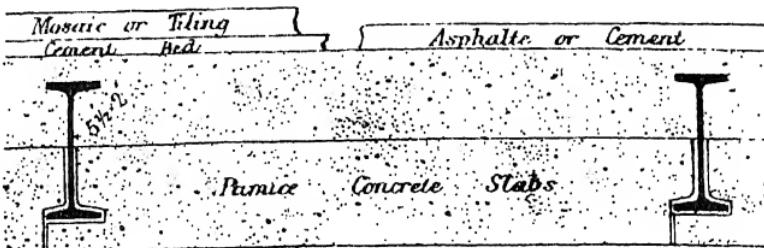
Lindsay, Neal, & Co.'s Concrete-Slab Floor.
